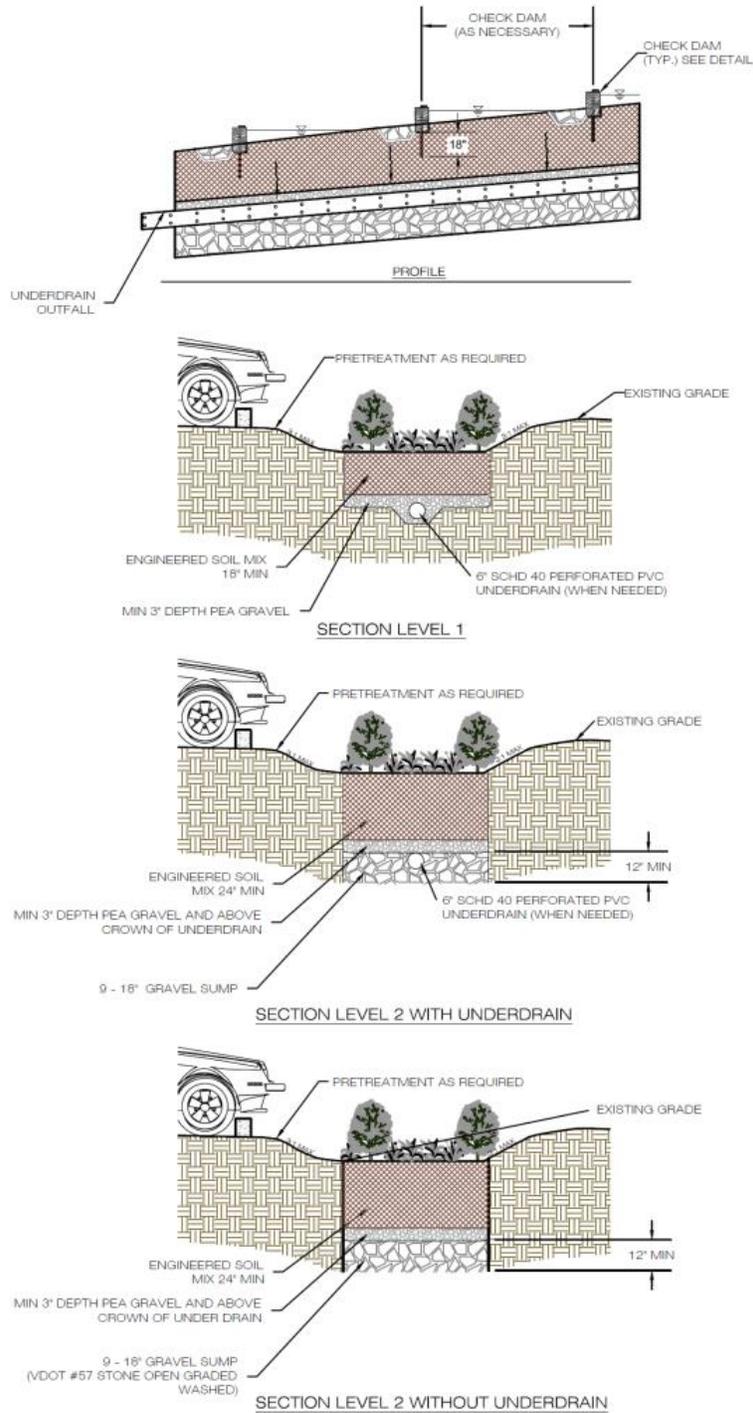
Typical Details for Level 1 and 2 Water Quality Swales (source: VADCR, 2011)
